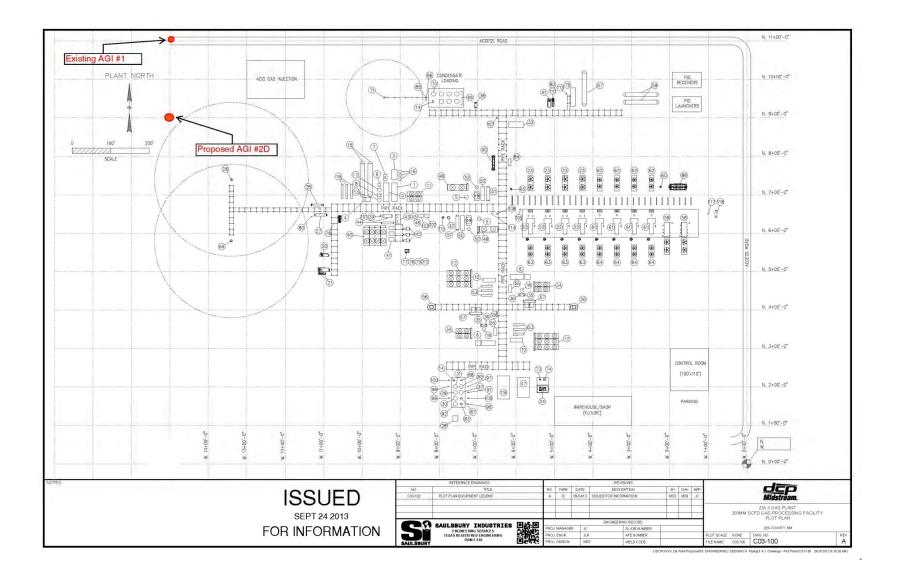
Proposed Location of Zia AGI #2D and Zia Gas Plant Layout
